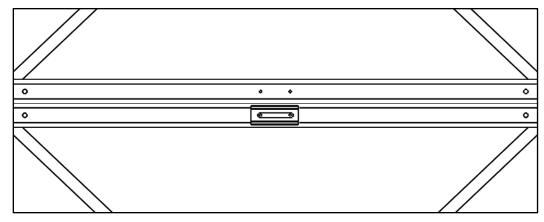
Eye/Face Wash Mount Steel Strut Placement
